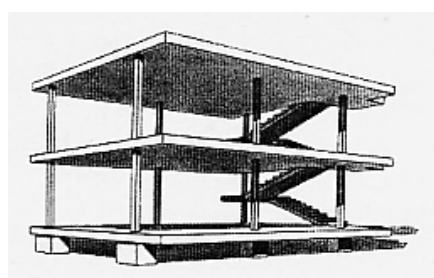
Le Corbusier, *Maison Dom-Ino* reinforced concrete structural frame, 1915. (Frampton, 1980)
